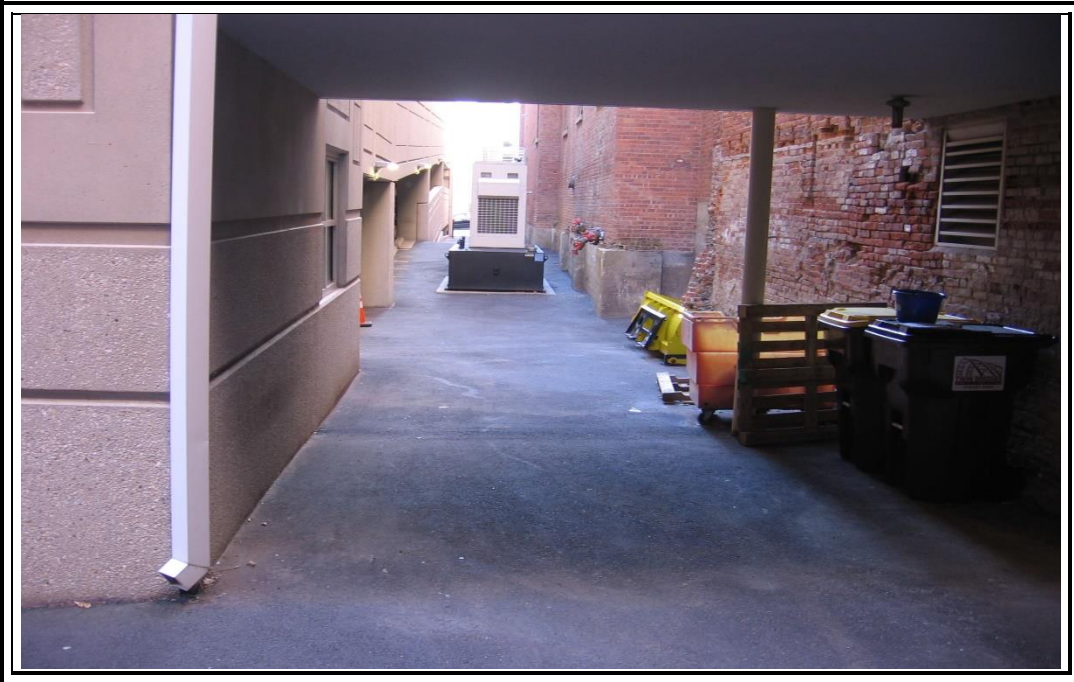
Looking northeast; paved surface cover adjacent to rear side of 140 State Street building (12/3/20).
